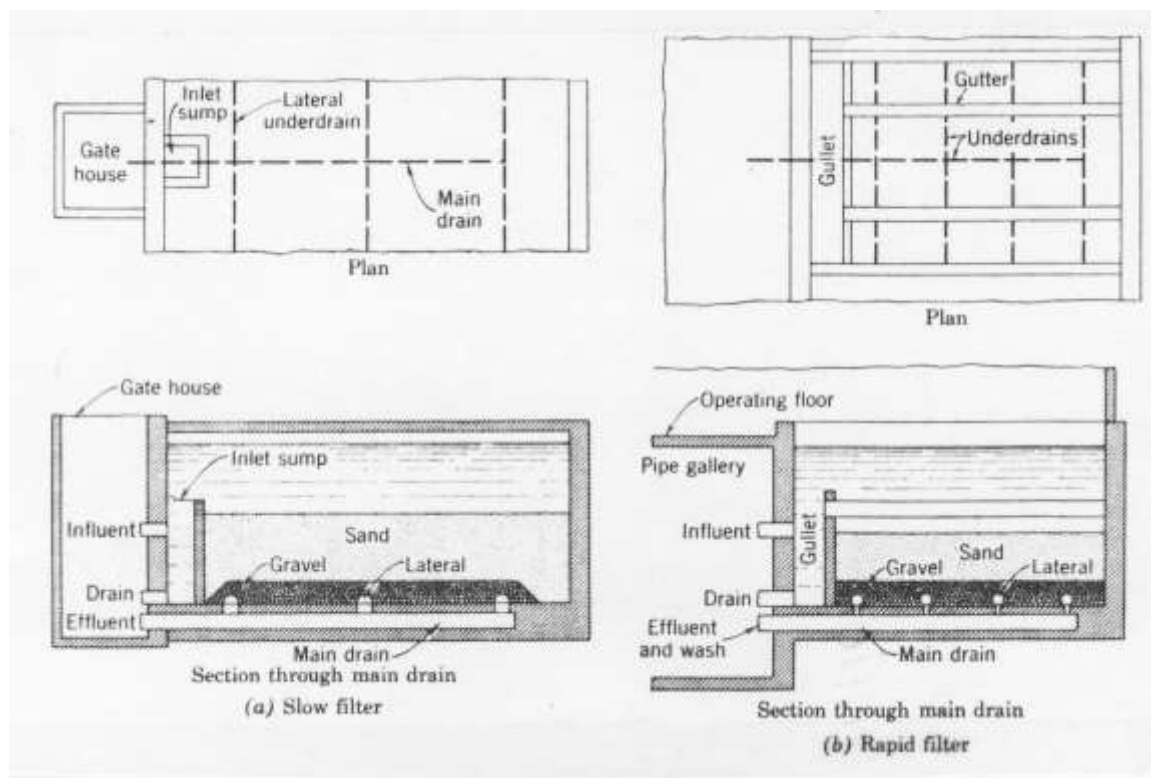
PLAN AND CROSS-SECTION OF SLOW AND RAPID SAND FILTER.
